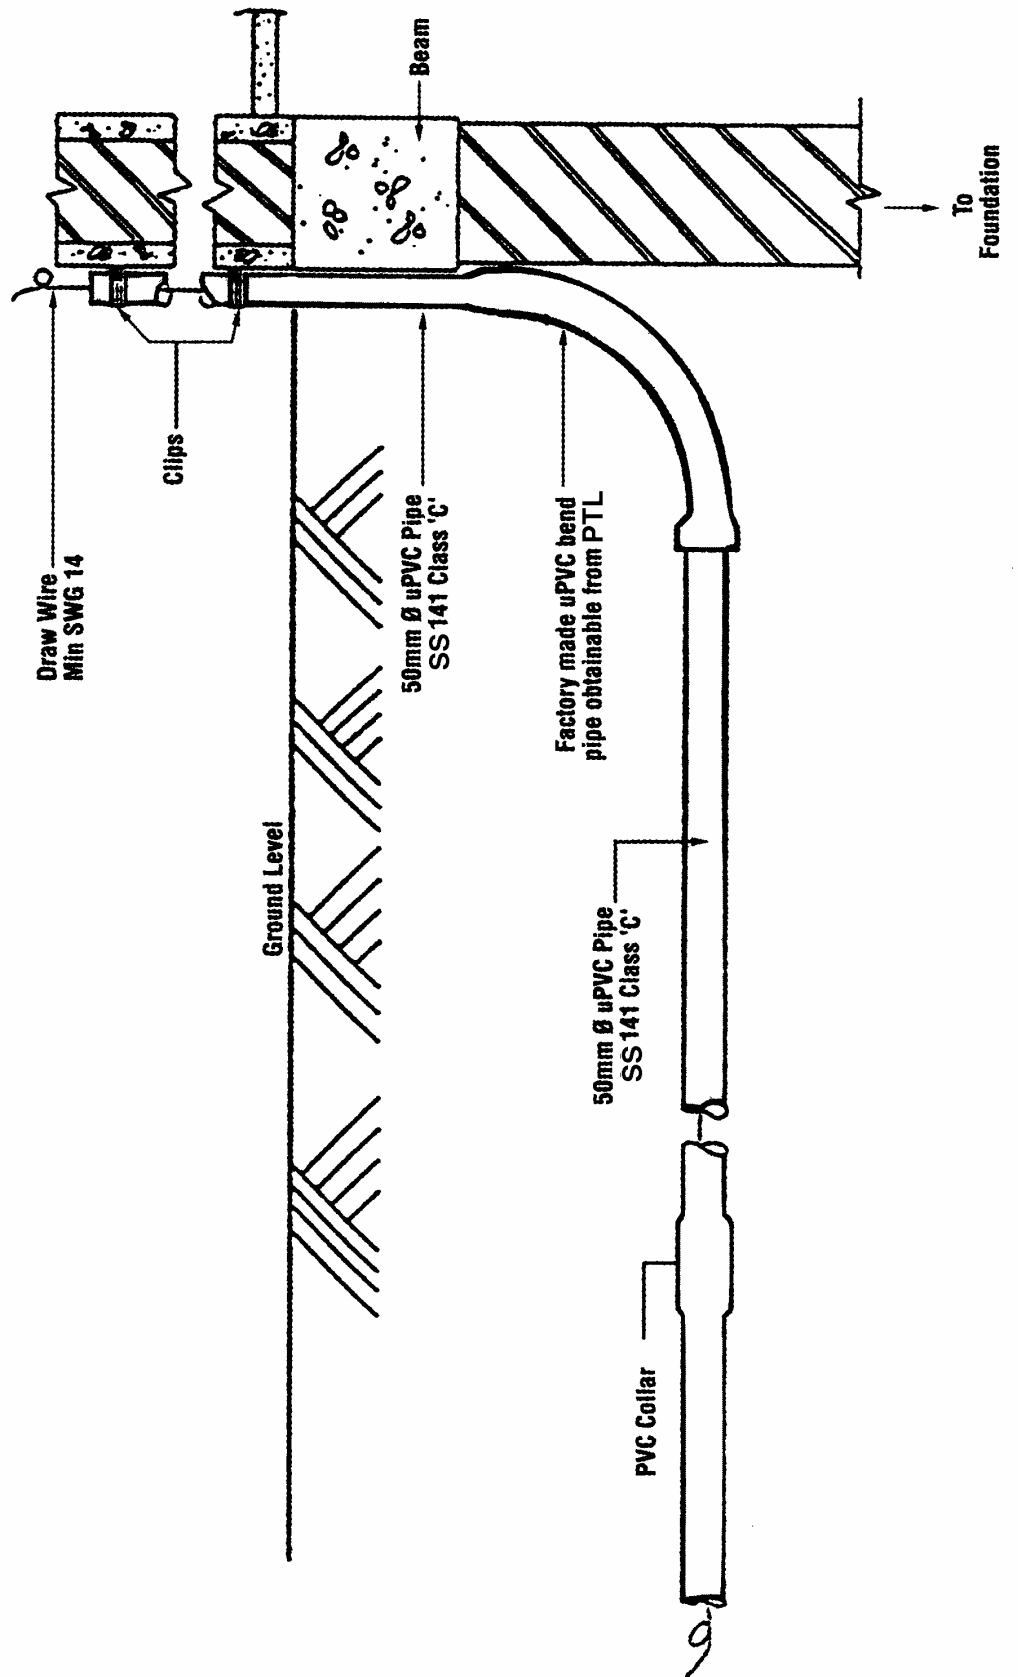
(d): DETAILS OF LEAD-IN PIPES WITH BEND PIPES
